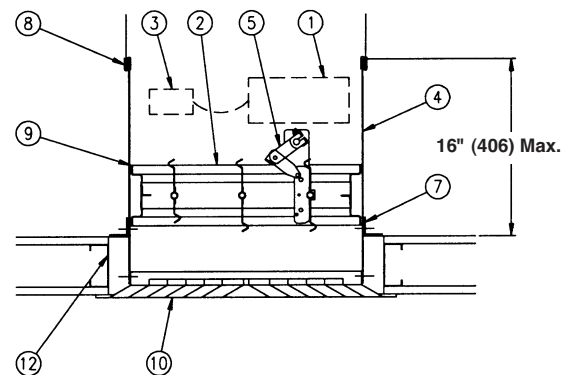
DAMPER WITH ACTUATOR MOUNTED INTERNALLY
